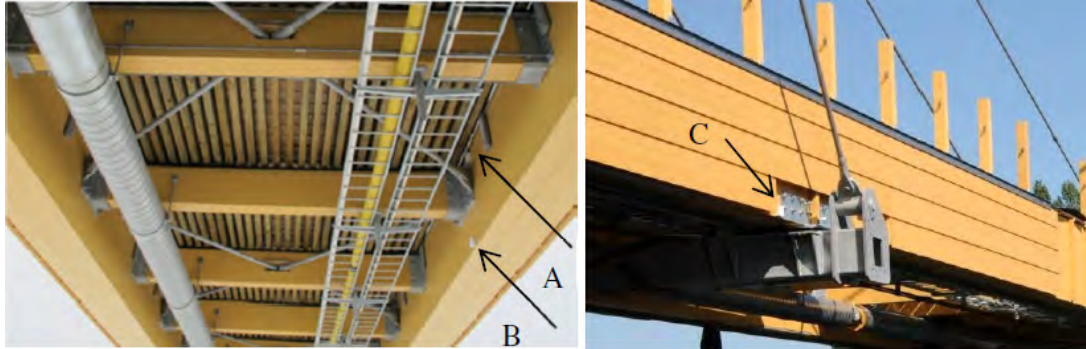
Älsvbacka bridge. Sensors A and B in the internal part of the beam (top) and sensor C on the outside beam protected by cladding (bottom).
